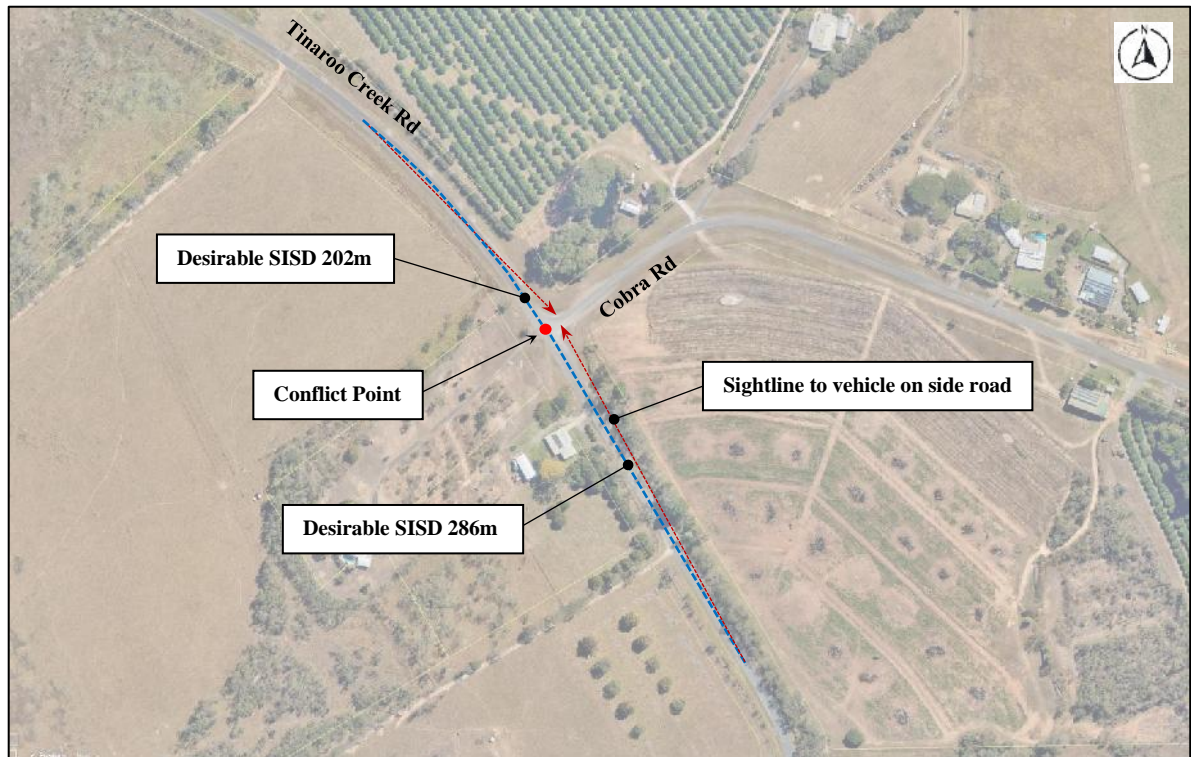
Tinaroo Creek Road/Cobra Road Intersection - SISD Assessment
